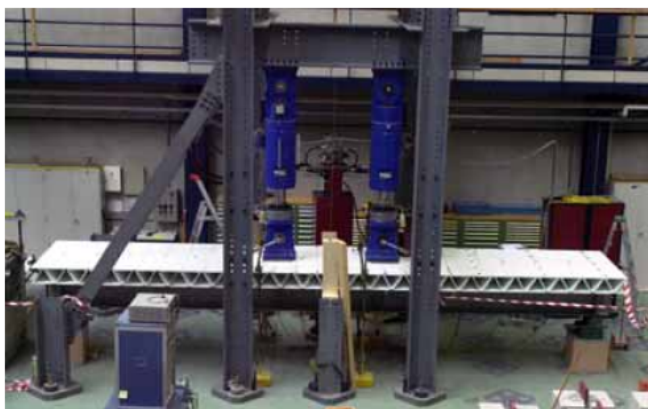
Composite FRP/steel girder with adhesively bonded connection [8]
